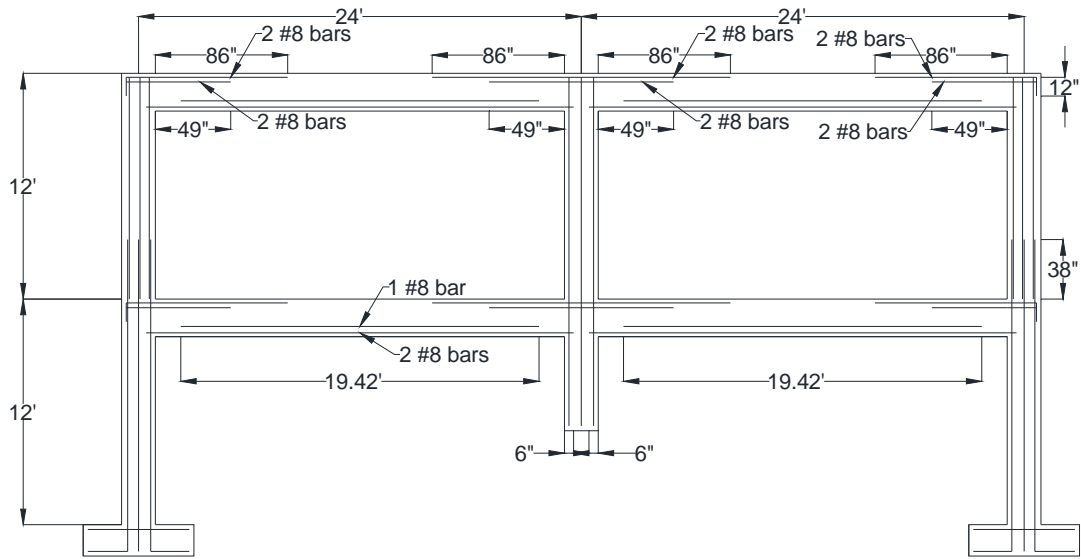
Longitudinal reinforcement layout for full scale discontinuous frame
